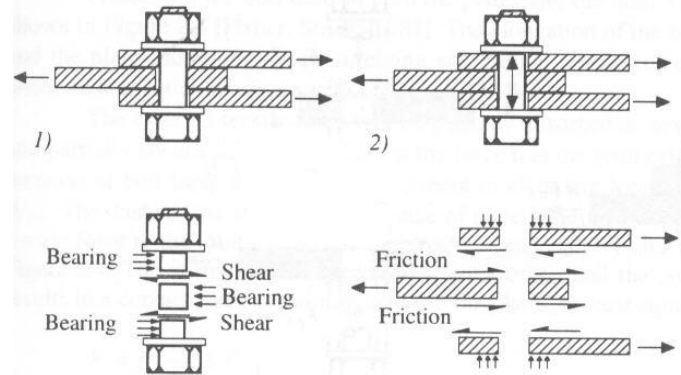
Force components in the bearing bolts (1) and preloaded bolts (2) [2].
